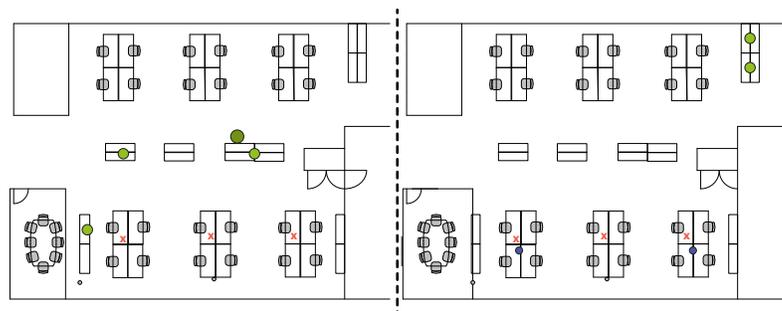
(a) D1 original layout (b) D1 experiment layout (without plants)
